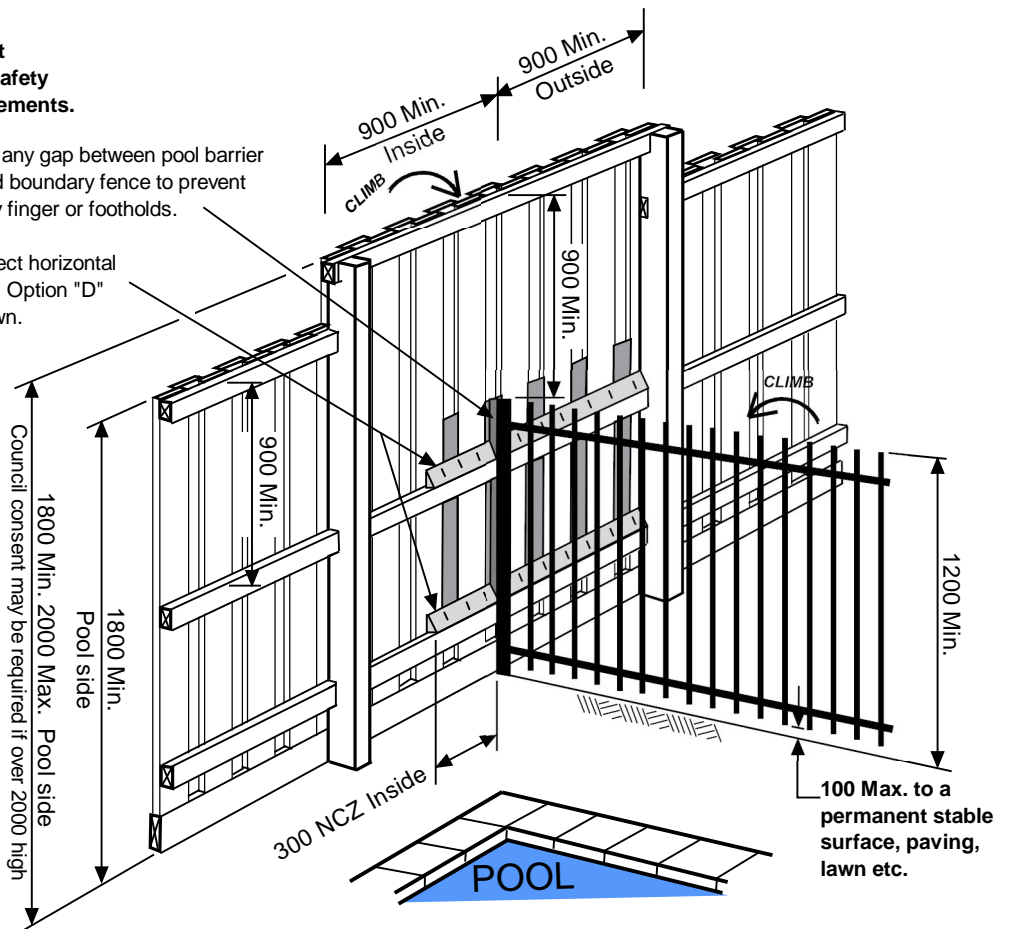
ALTERNATIVE BOUNDARY FENCE INTERSECTING A TYPICAL POOL BARRIER
